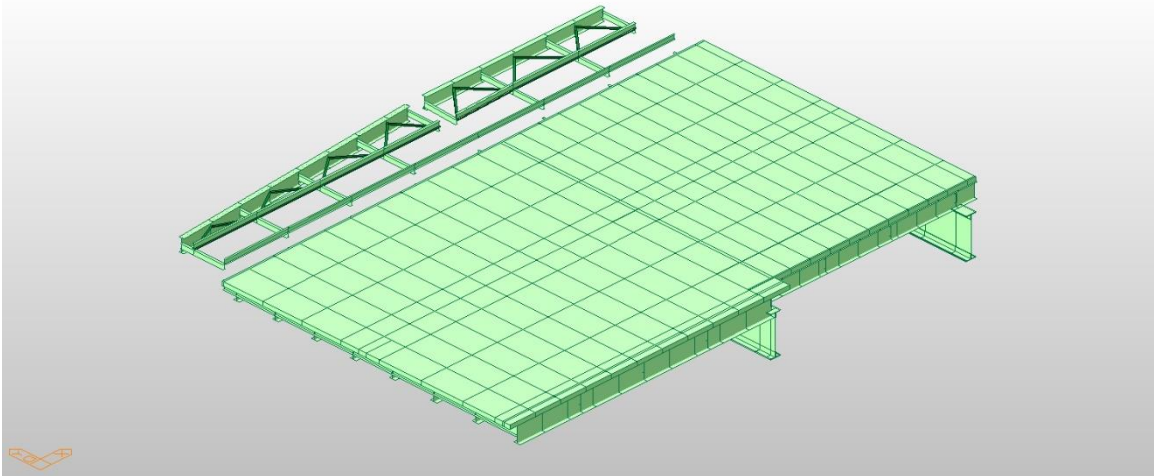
Approach and Tower Spans at South Tower (Similar at North Tower)
